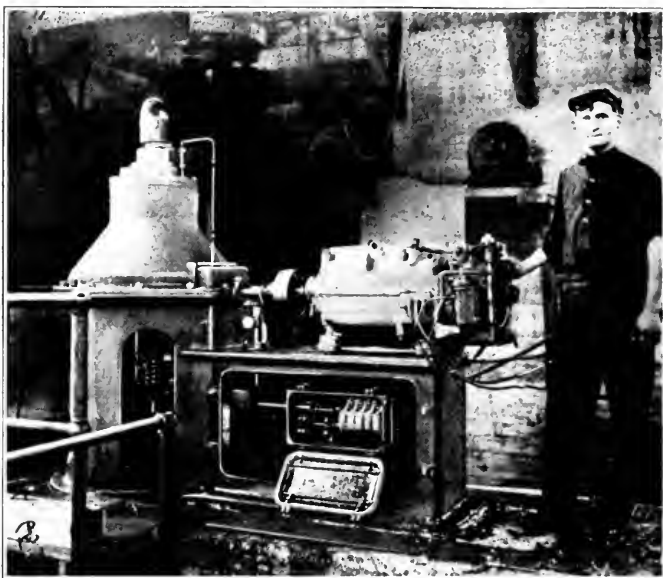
Cylindrical Valve Machine, Showing Type of Motor, Brake and Limit Switch—For All Lock Machines.
